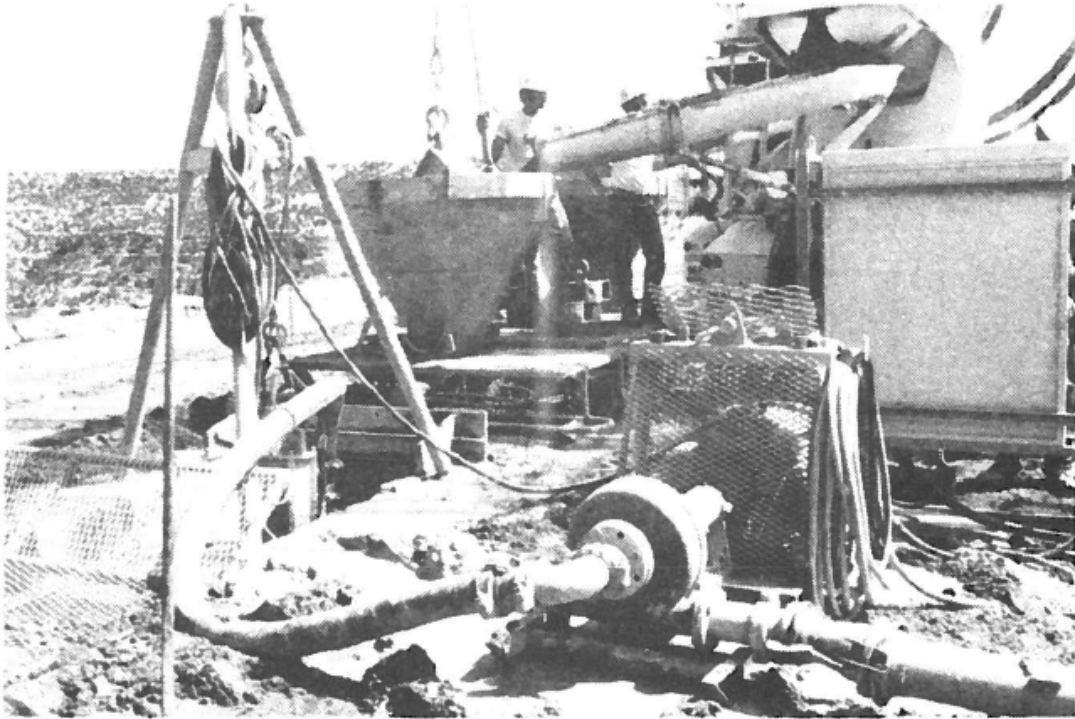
Concrete placement for cutoff wall panel. Pump in foreground removes displaced bentonite from trench.
